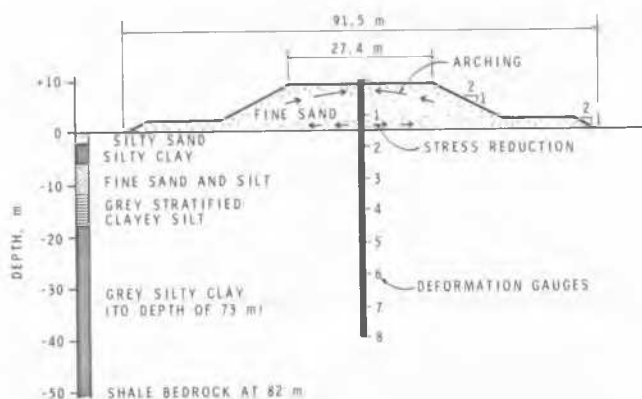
Installation of steel-pipe pile, 49 m long, 32 cm diameter, through sand embankment
